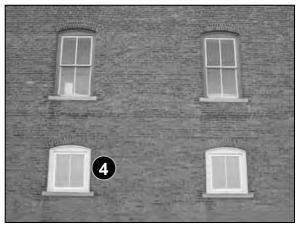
198 North St. The original arched top windows have been replaced with smaller, flat-top windows, and don't match from the second to the third floor.
